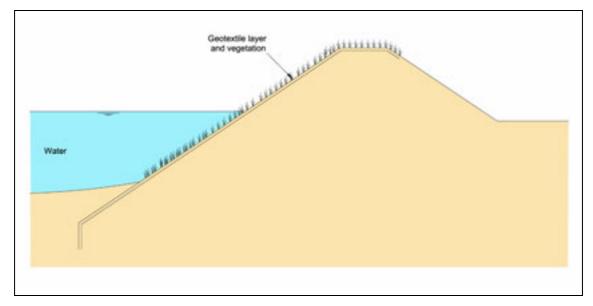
Toe and inward face protection using geotextile and vegetation
